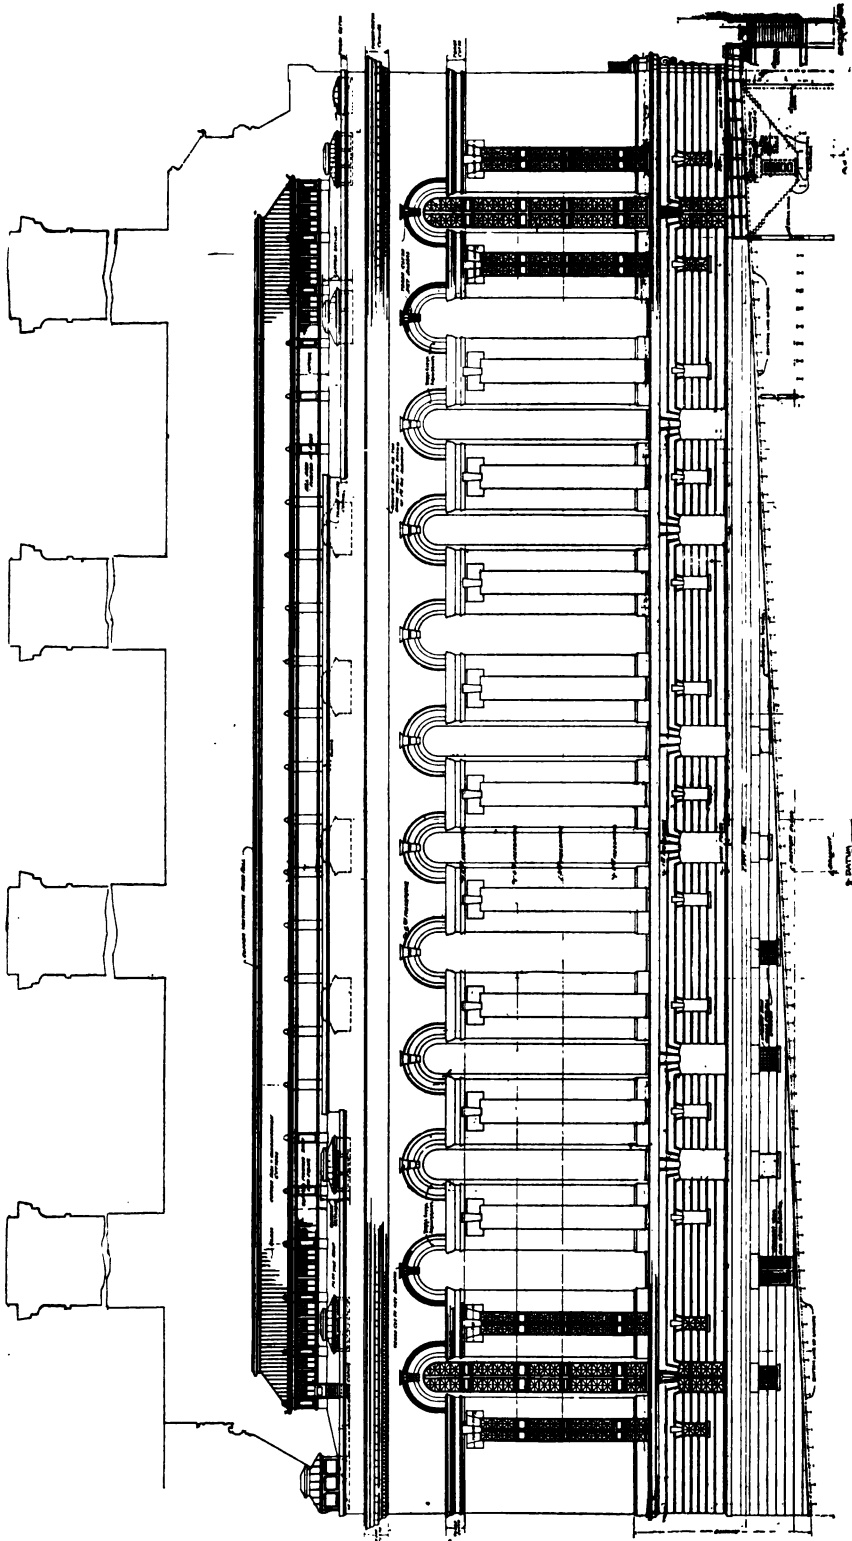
Side Elevation, Fortieth St., Waterside No. 2.
